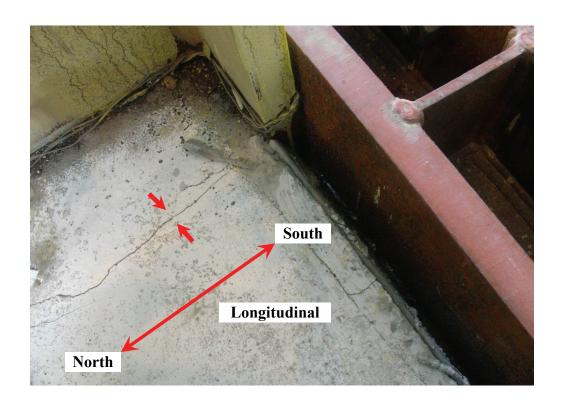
Onset of the Crack in Intermediate Concrete Slab (Photo Courtesy of C.H.Lin and K.C.Tsai, NCREE)
